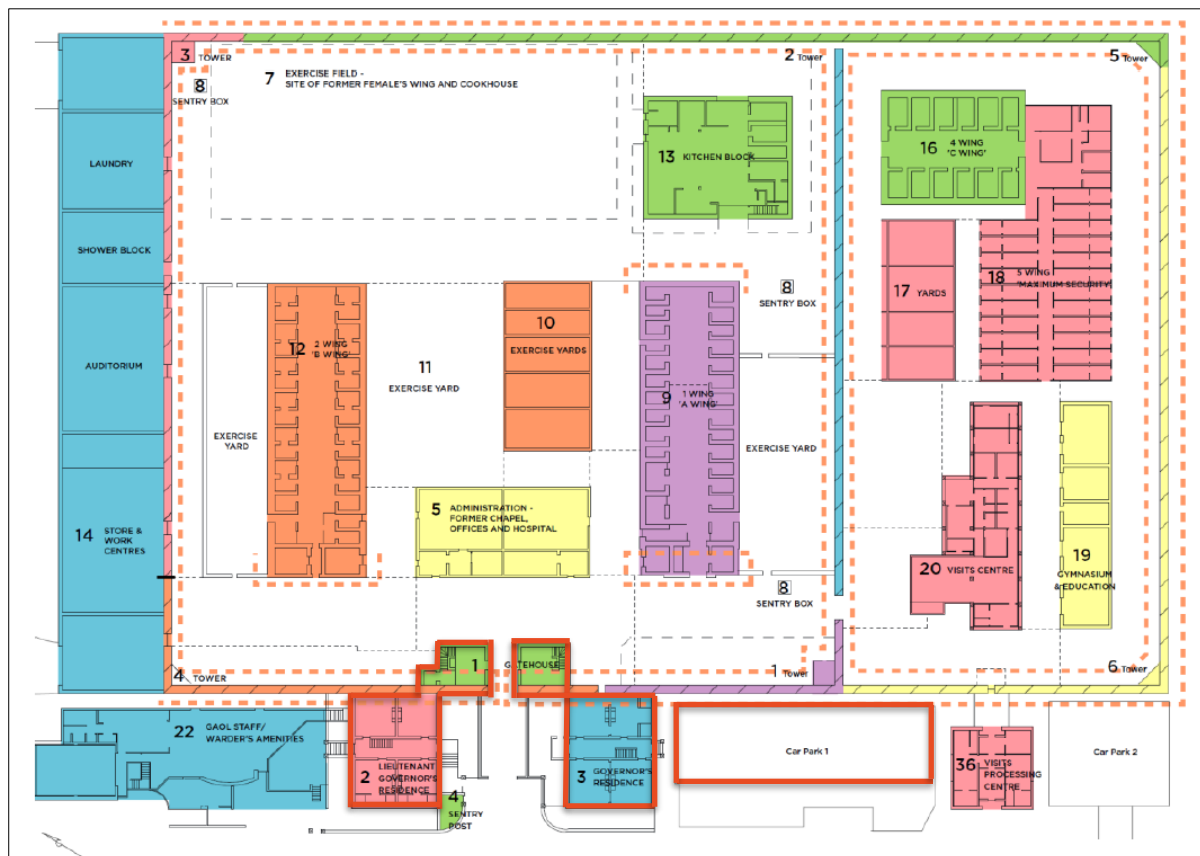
Maitland Gaol Site Layout. Adapted from Maitland Gaol Development Plan
